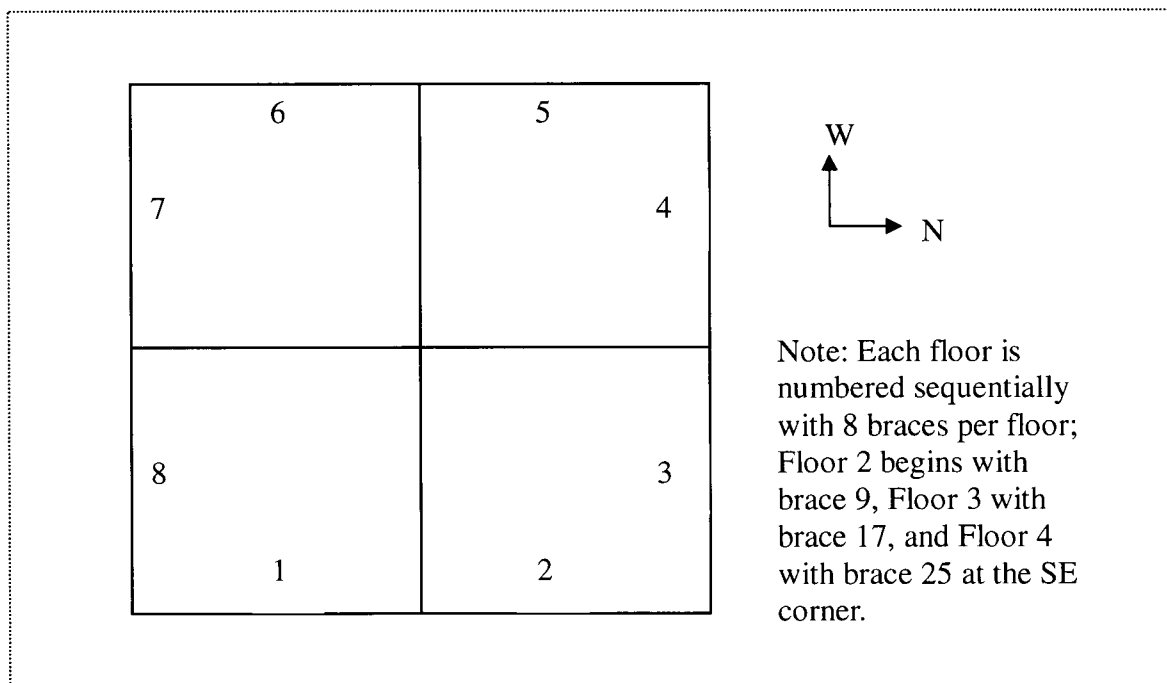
Brace Numbering – Plan View of Typical Floor
